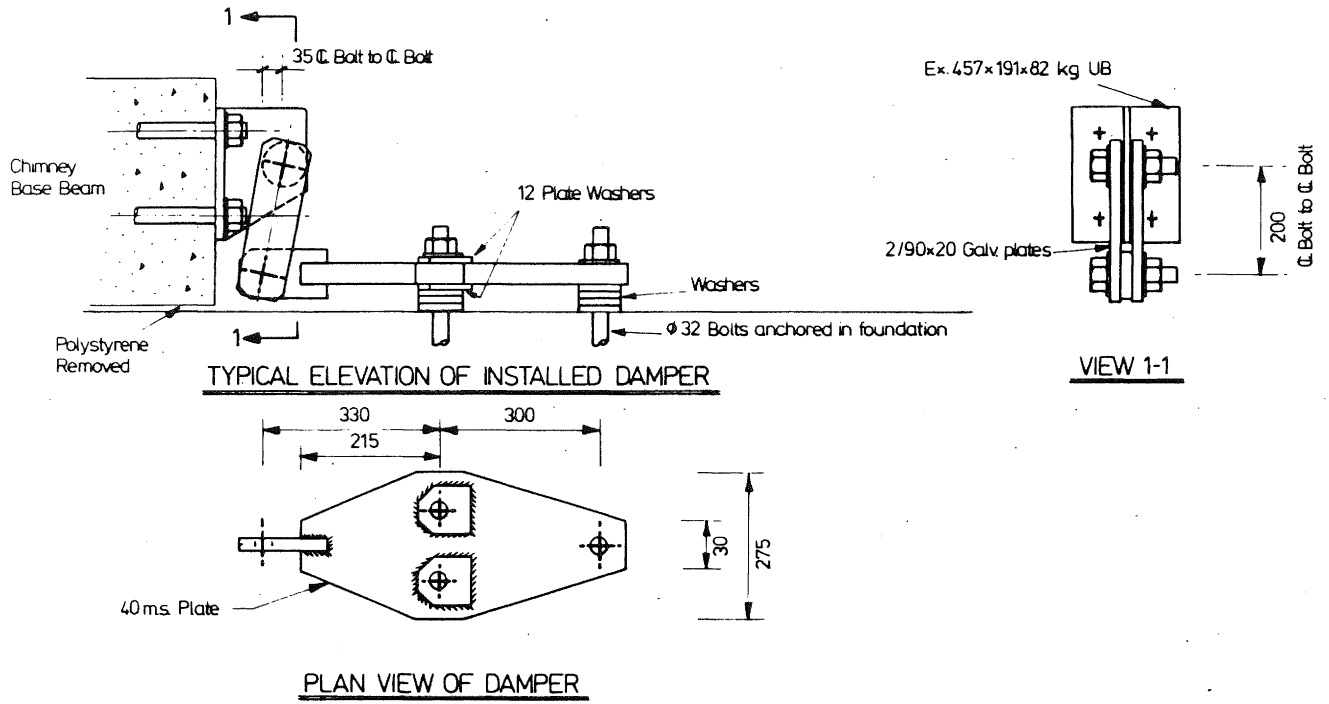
DETAILS OF HYSTERETIC DAMPERS
